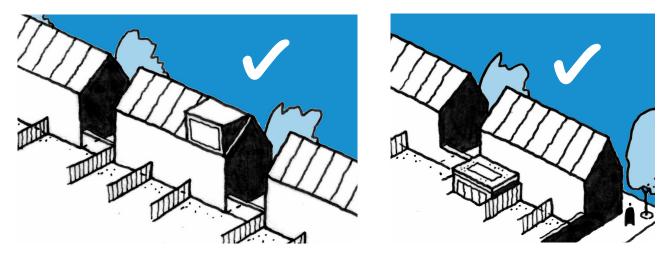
Extensions and alterations (such as dormer windows) to the rear of a property that is flanked and backed onto by other properties, or face a parking court, are not visible from the street. Therefore these are generally accepted.
